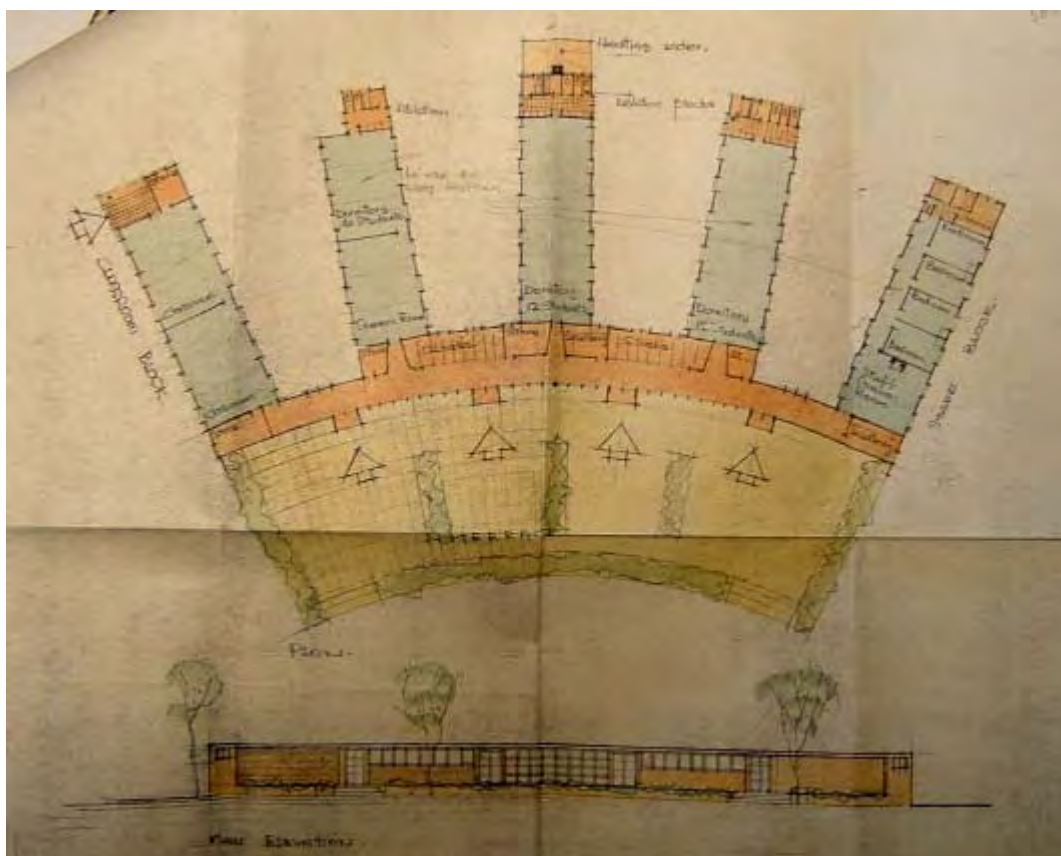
Plan and elevation of The Leas hutments at Eaton Hall by the County Architect's Department. June 1947.⁸¹
